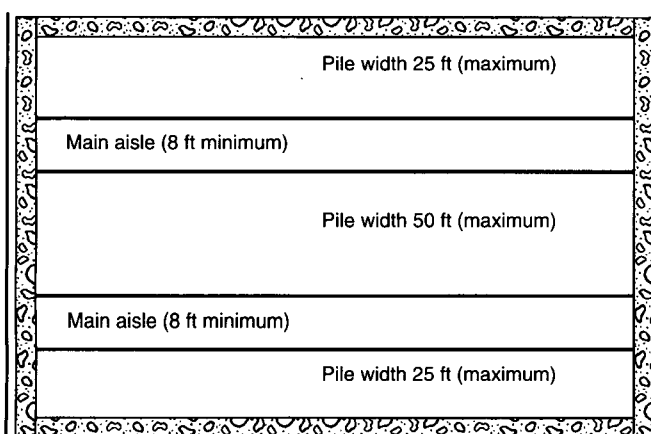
Typical piling arrangement in accordance with Section 3-1.
